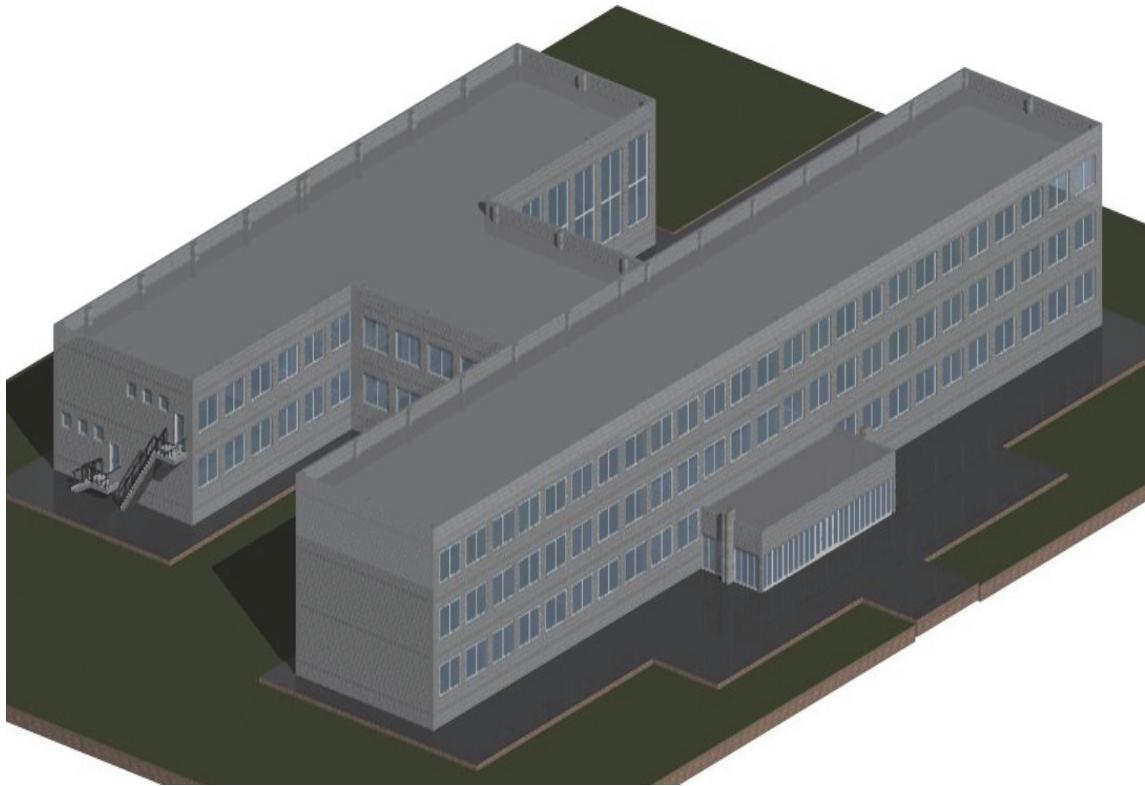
Typical Typology D-2 school site with two buildings connected by a corridor structure (EEC et al., 2015).
